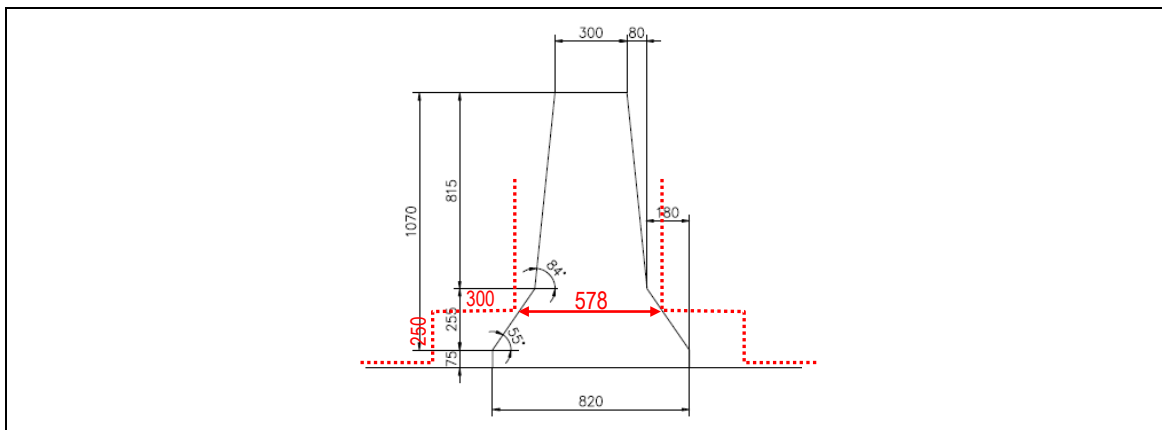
New Jersey Barrier (TL-5 for General Section)
